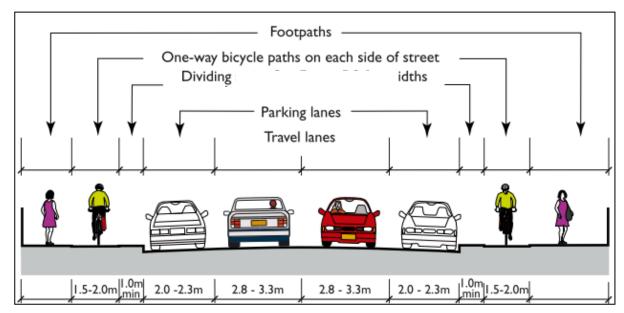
Typical Cross-Section - One-Way Pair of Off-Road Bicycle Paths
